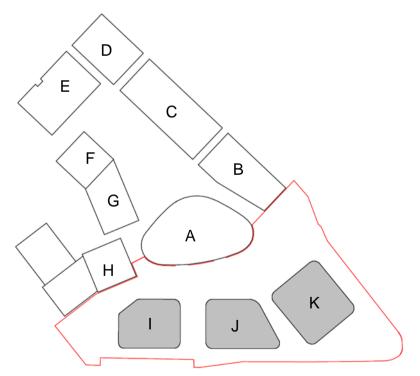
2022 Amended Proposed Development Site Arrangement
